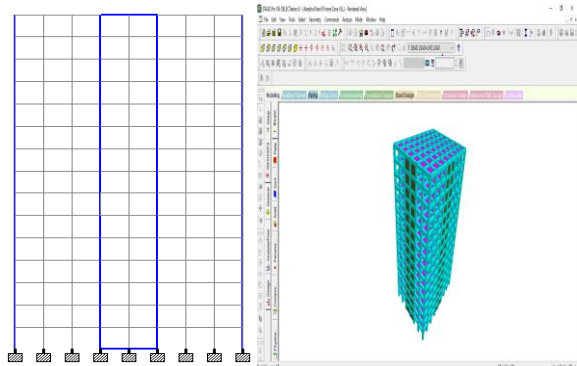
Framed building with Shear wall at the exterior side along X and Z-direction, Zone- III & IV
